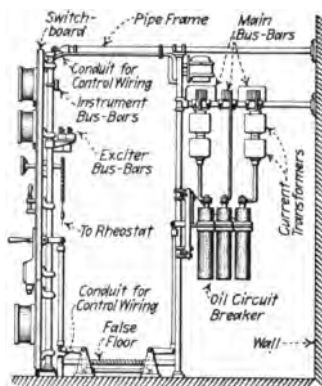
Arrangement of mechanical remote-control switchgear utilizing wall and a pipe frame for a supporting structure.\
